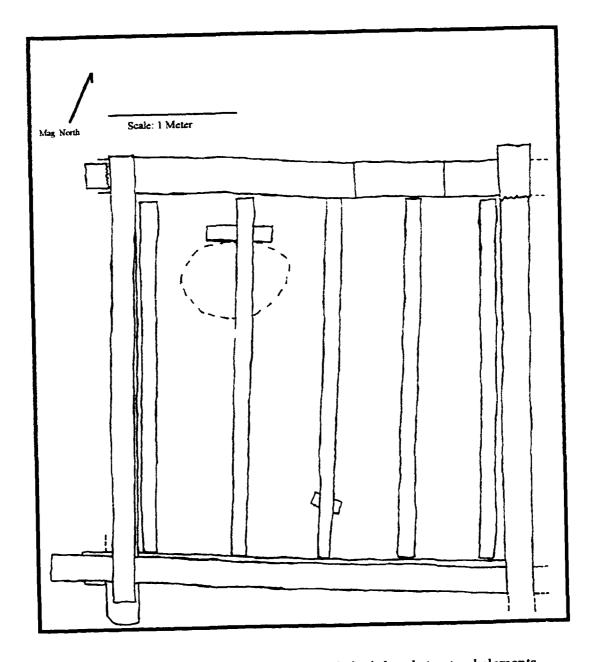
Coldfoot Feature 5, excavated foundation's basal structural elements. Overlying floor boards and roof/wall collapse are not illustrated.
